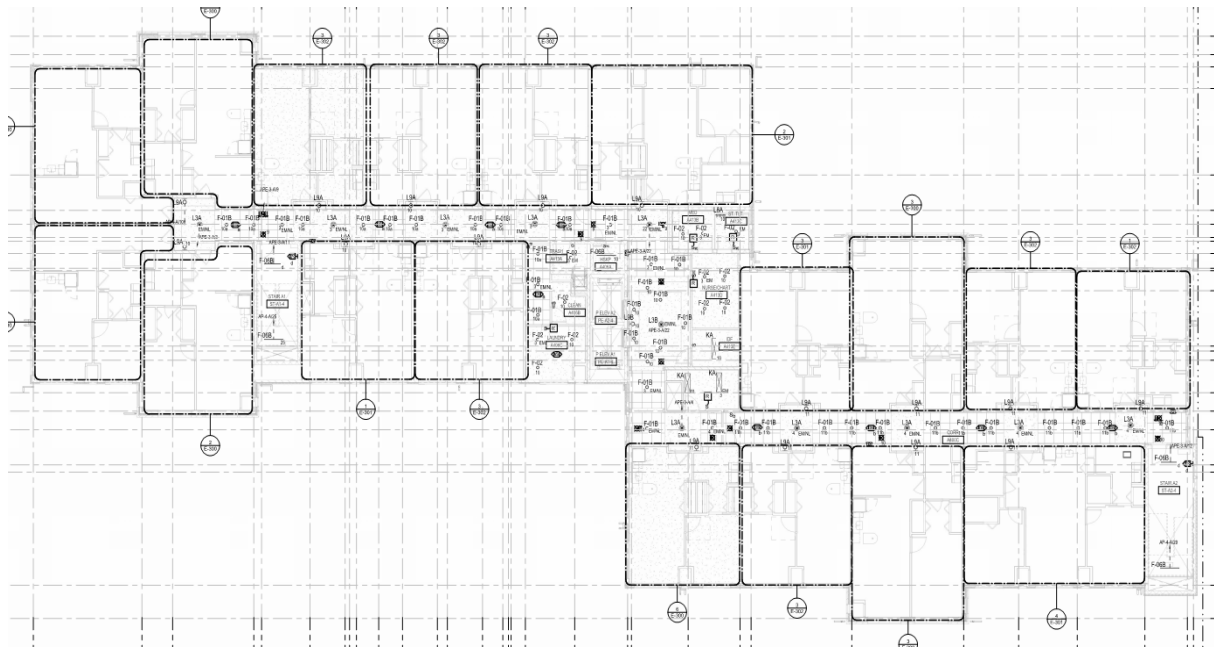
Drawing E-204A, Floor 4-6 lighting fixture layout, square footage same as level 2
